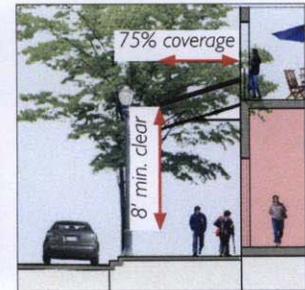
Awning section with minimum clear height above sidewalk & desired coverage.
